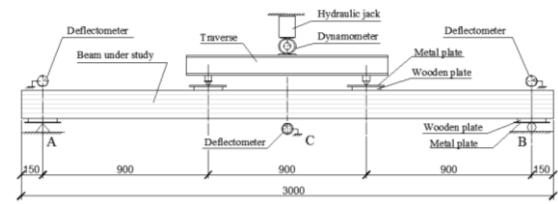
The scheme of the experimental installation when testing beams from glued wood
